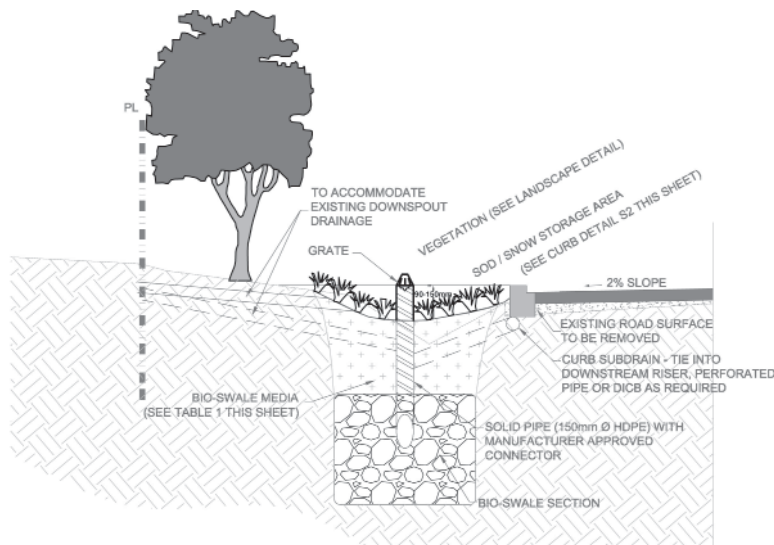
A cross-section detail from a bioretention area or a bioswale depending on the slope along the length of the facility. For detailed instructions, notes are provided to direct the contractor to separate detail sheets. (Source: Aquafor Beech)
